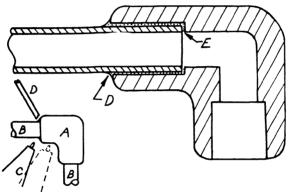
A "capillary" soldered joint: A. Fitting, B. Tubing, C. Torch, D. Solder, E. Tubing stop
